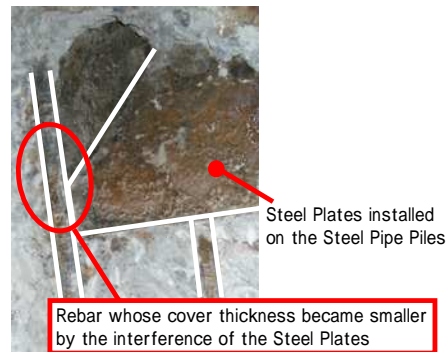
Corrosion State of Rebar around the Steel Pipe Piles
